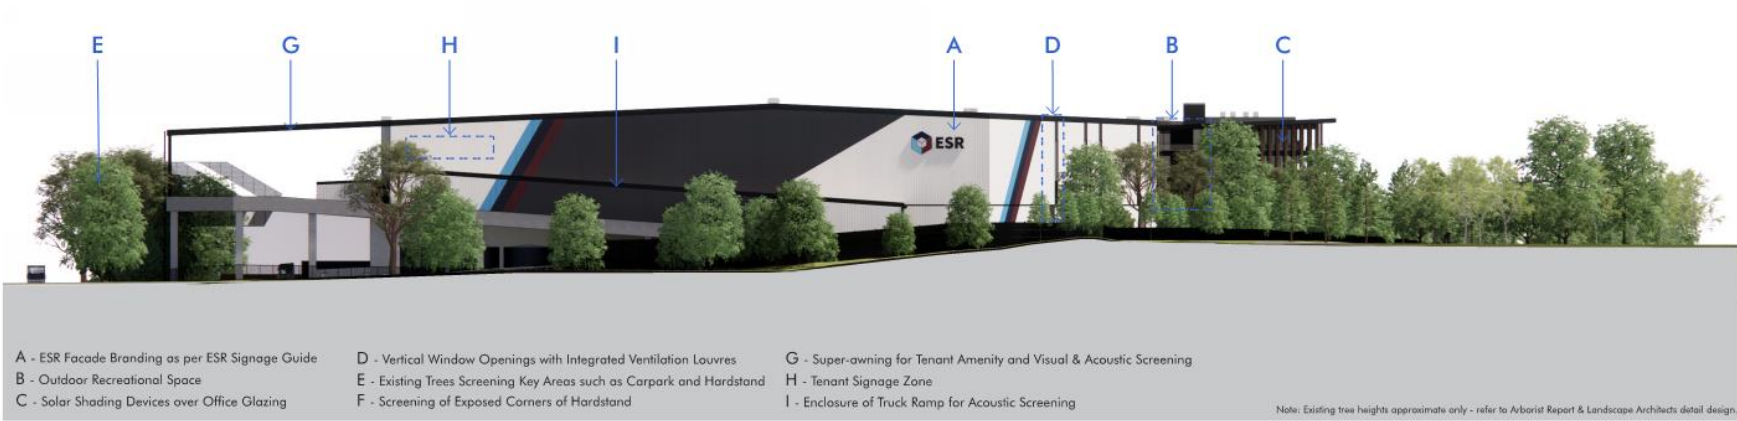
South Elevation Materials and Finishes (Source: Nettletontribe Architects, 2024)
